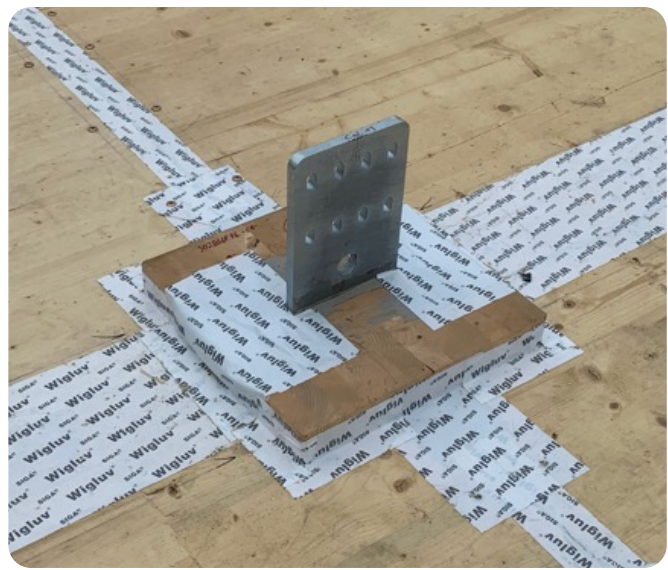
Tape used to bridge the gap between floor plate and column upstand. (Image: TDA)
